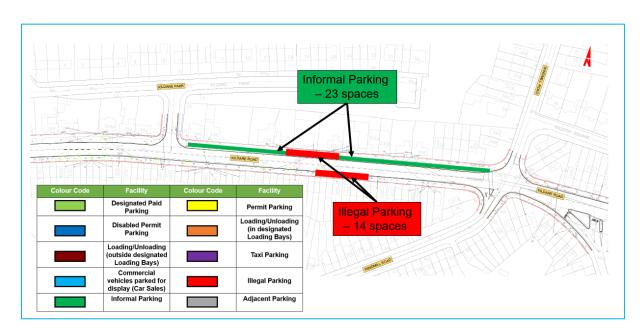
Locations of Informal Parking Kildare Road Section 1
